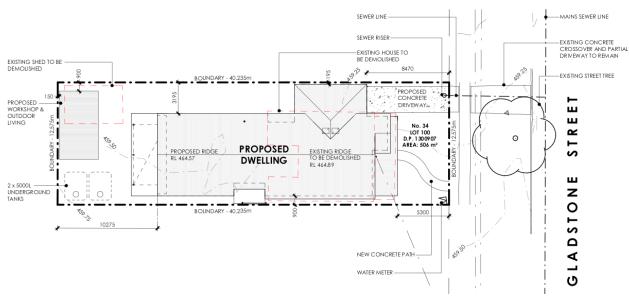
LAYOUT (SUNRAI DESIGNS)
